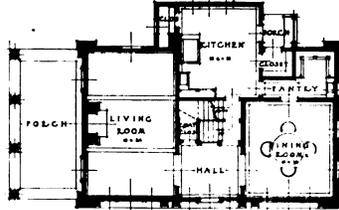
Central hall plan enlarged by small extension at rear. Floor area 1,152 square feet, exclusive of porches
